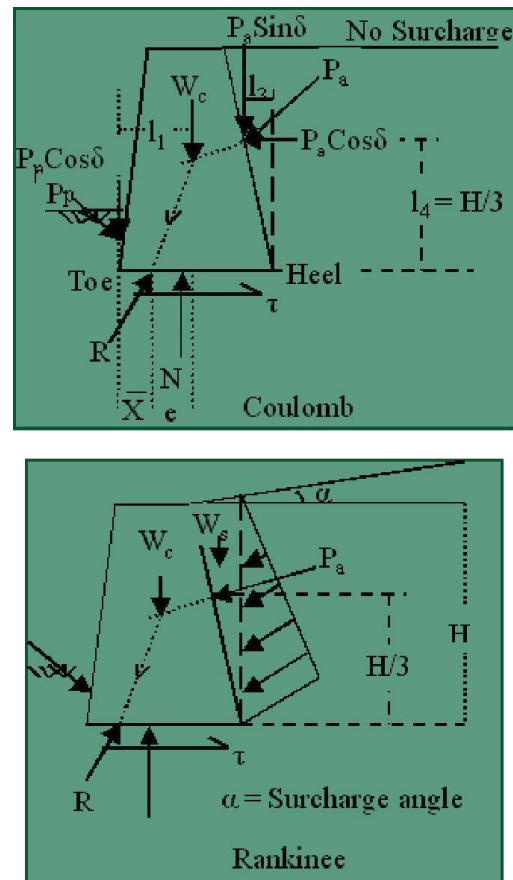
shows a typical trapezoidal section of a gravity retaining wall.
